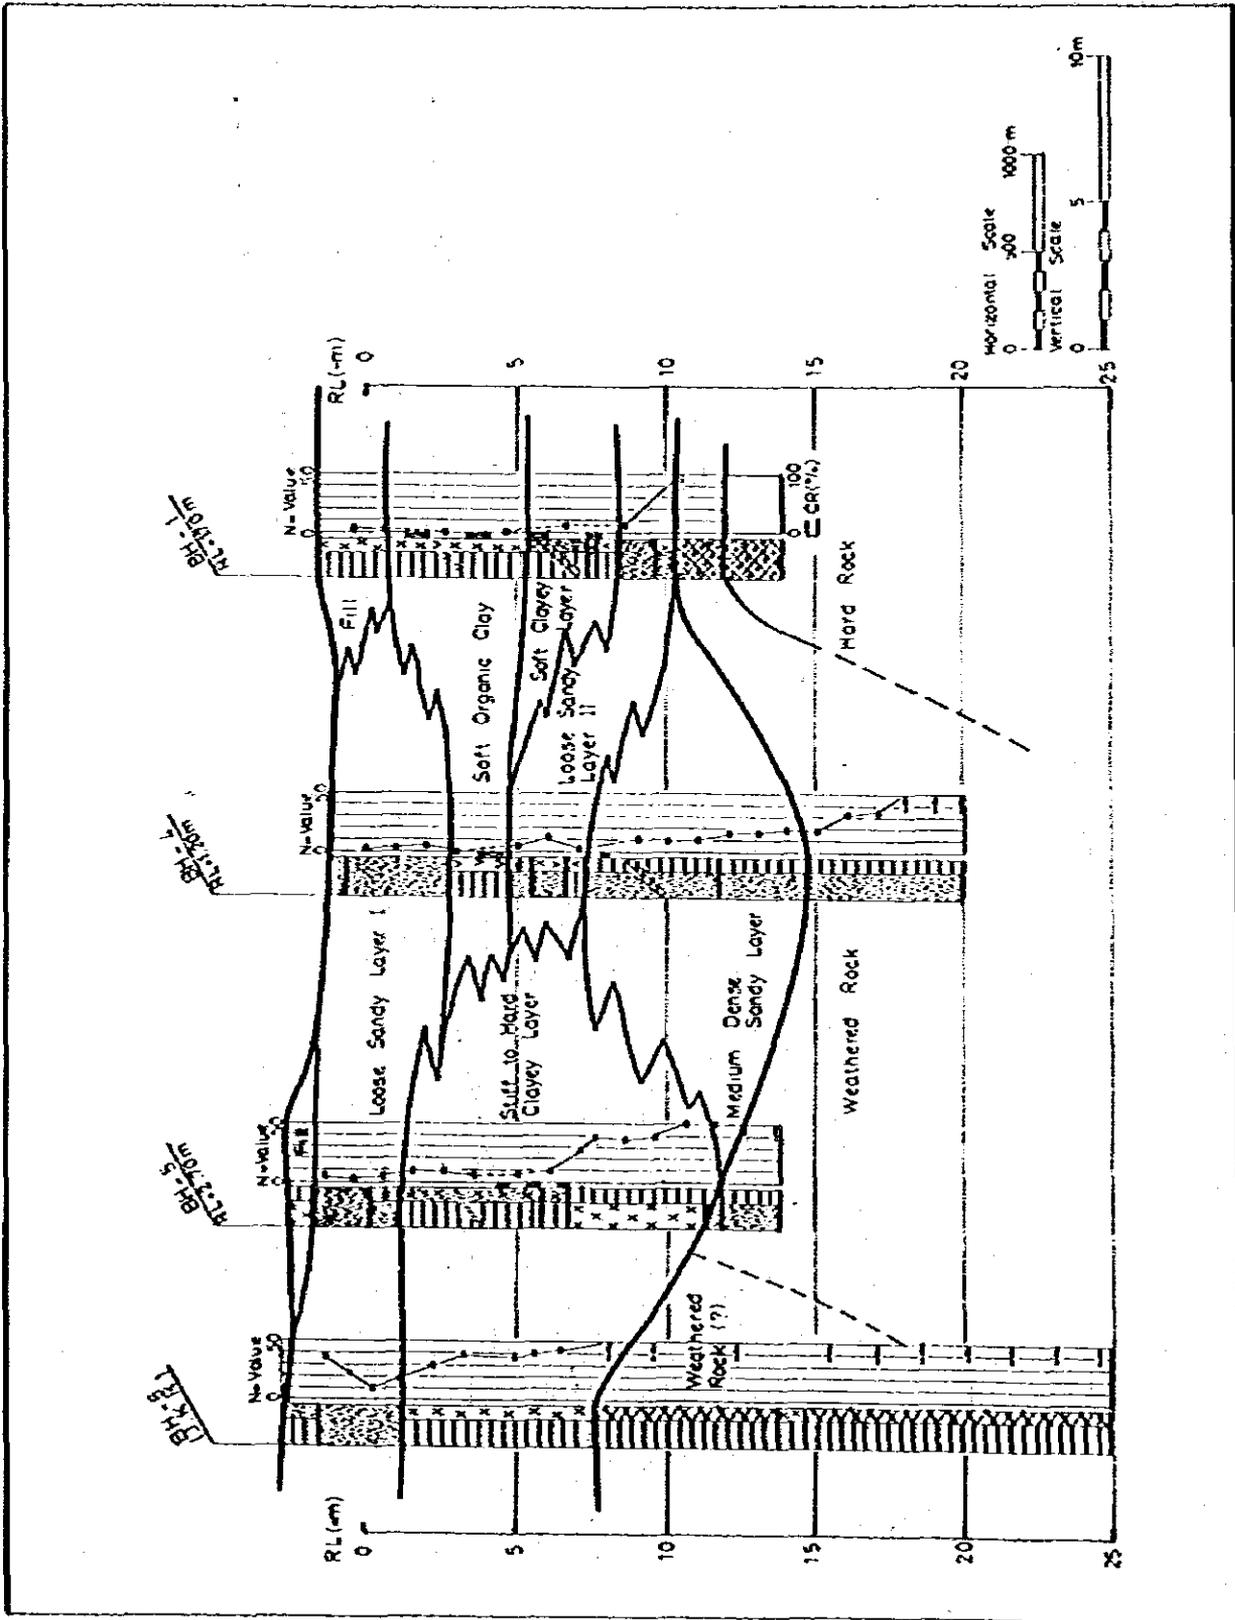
SOIL AND JOHOR BAHRU TOLL EXPRESSWAY ACCESS ROAD
